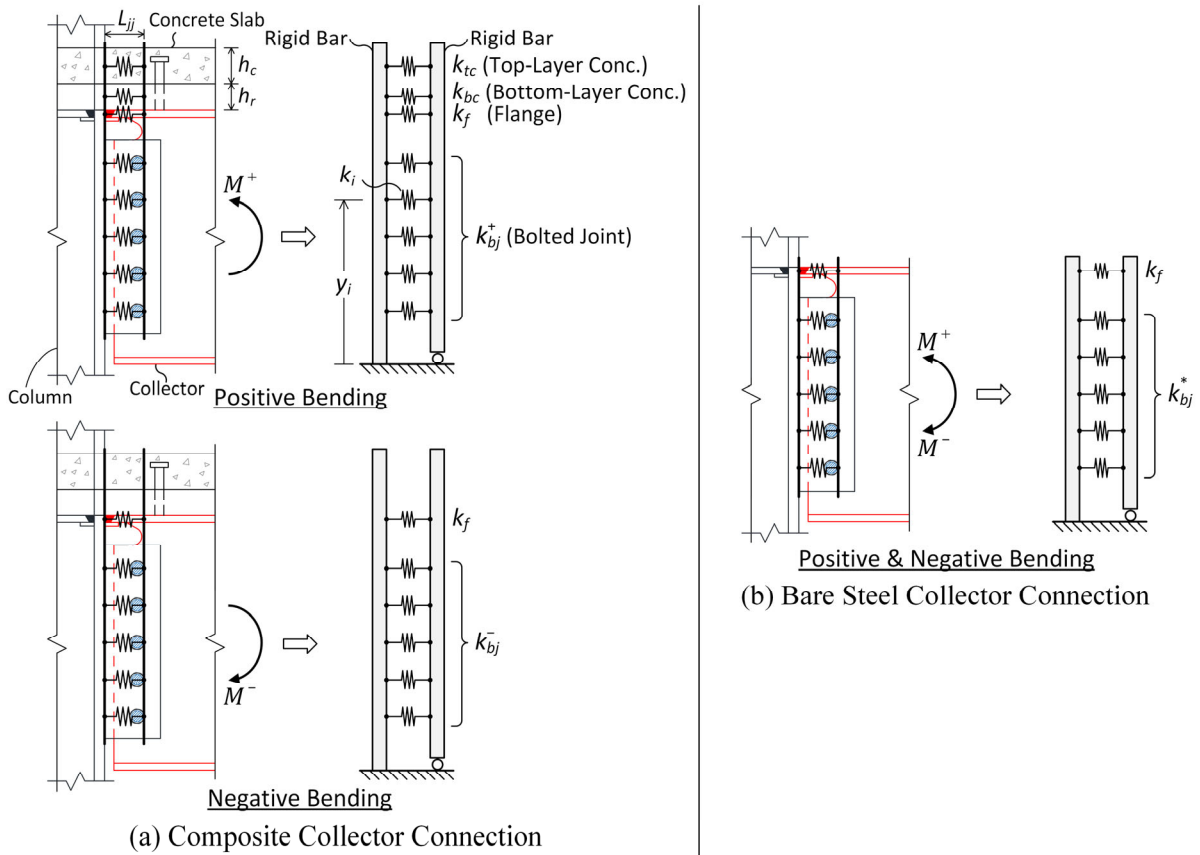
Spring Models for (a) Composite and (b) Bare Steel Collector Connections
